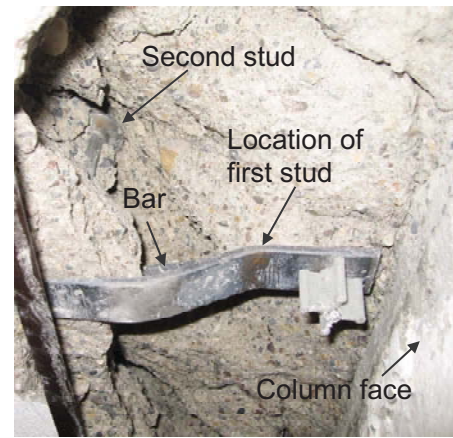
Punching shear failure and stud reinforcement damage in Specimen SB3
